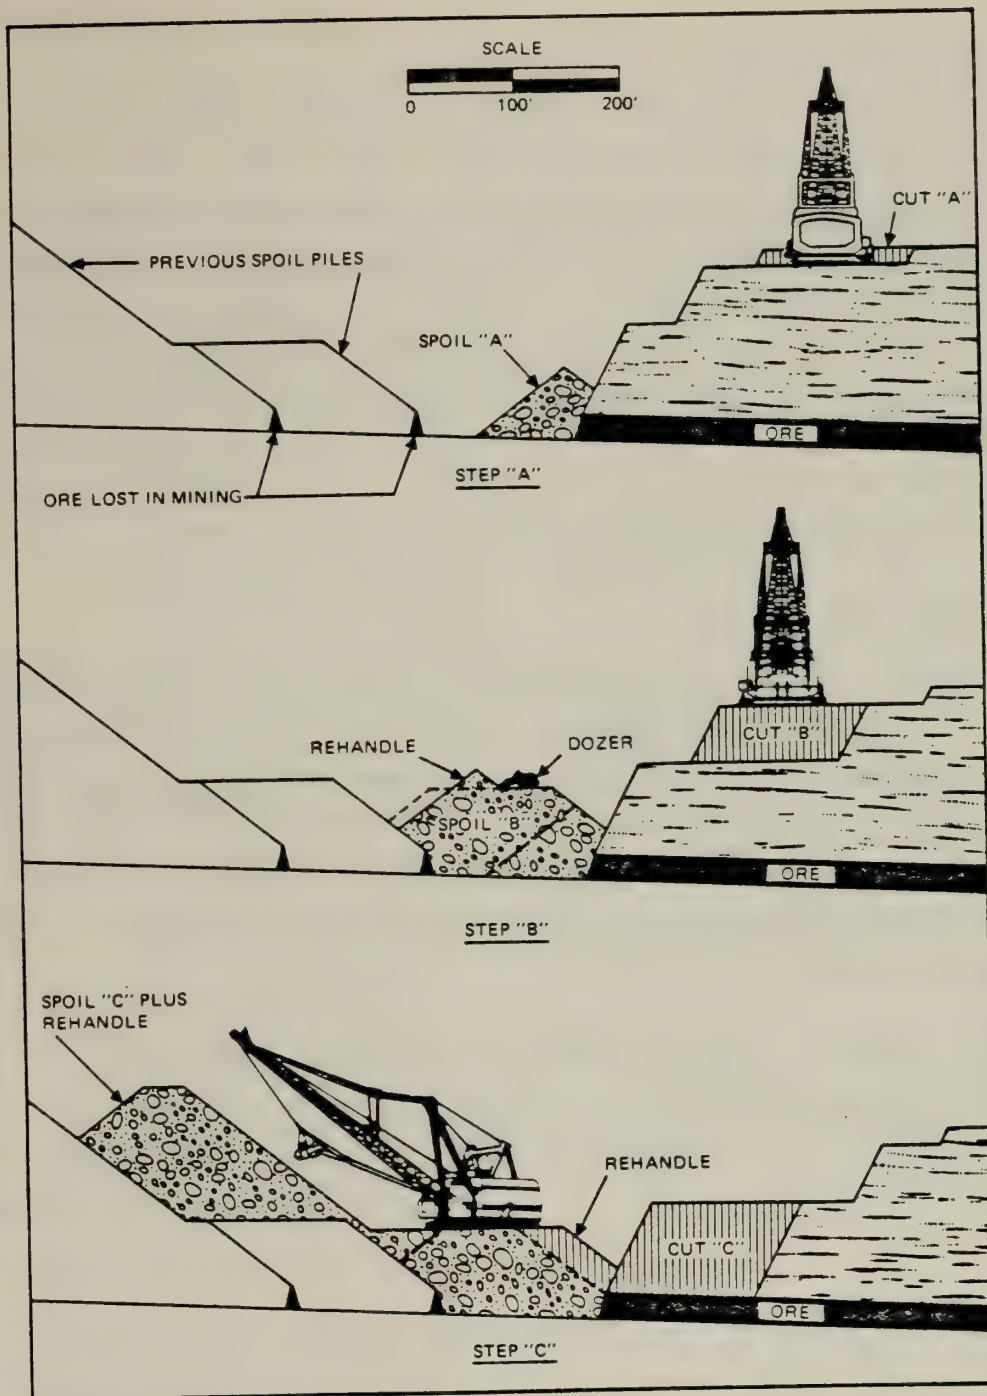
A TYPICAL STRIP MINING SYSTEM
